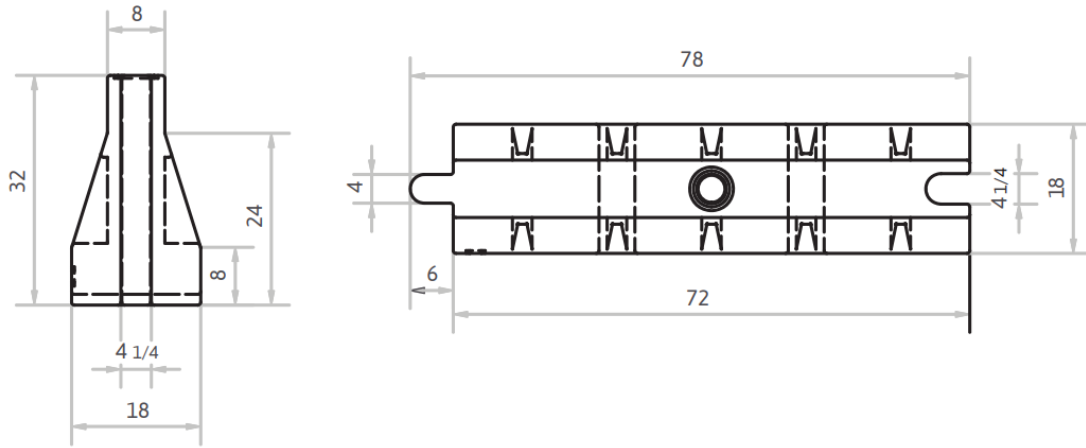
3. Dimension of the Full-Scale JB-32 Barrier Specimen, inches
